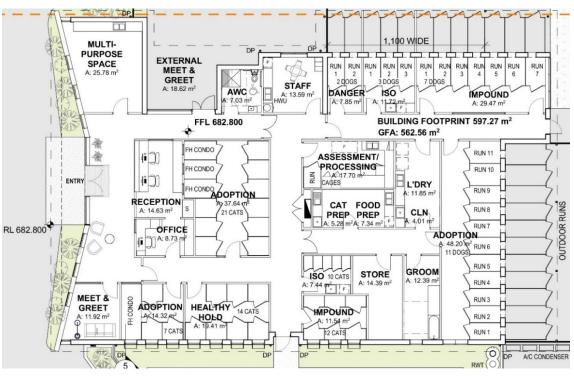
B: DA approved internal layout of Animal Shelter facility (source: F&J Tepa)
